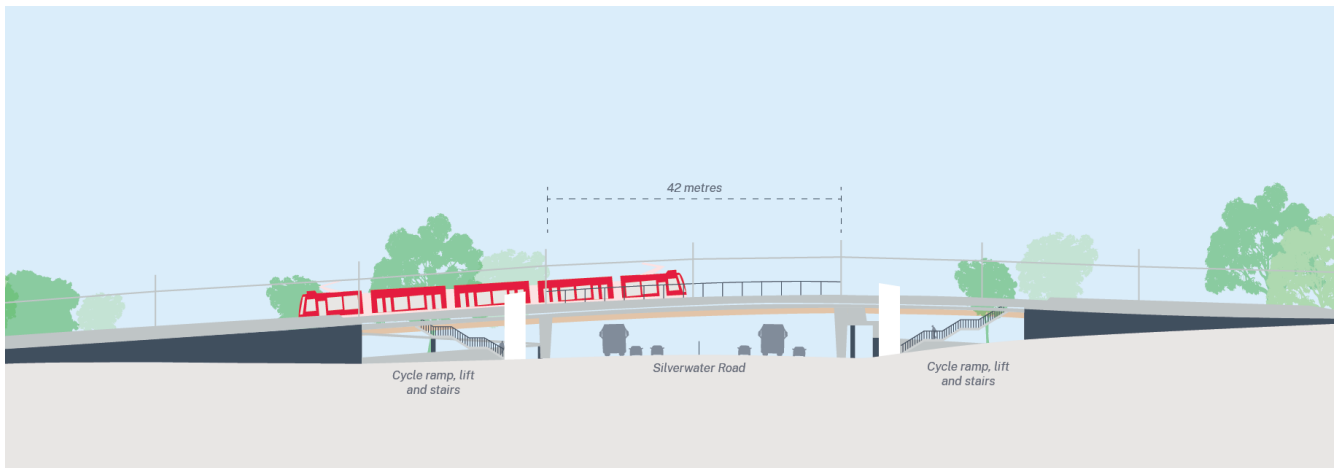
Indicative elevation of Silverwater Road bridge (viewed from the south)
